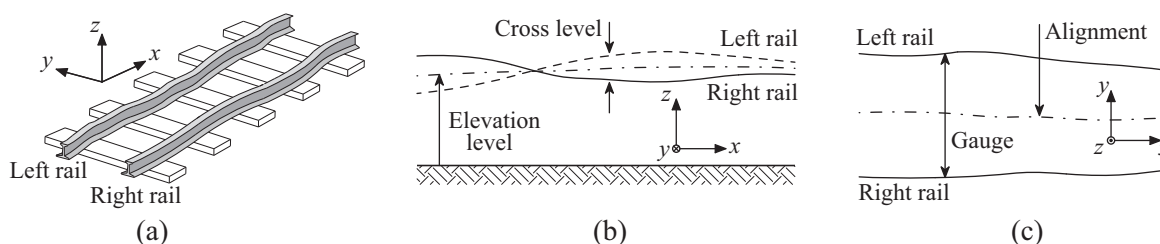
Types of track irregularities: (a) perspective view; (b) elevation view and (c) plan view.
